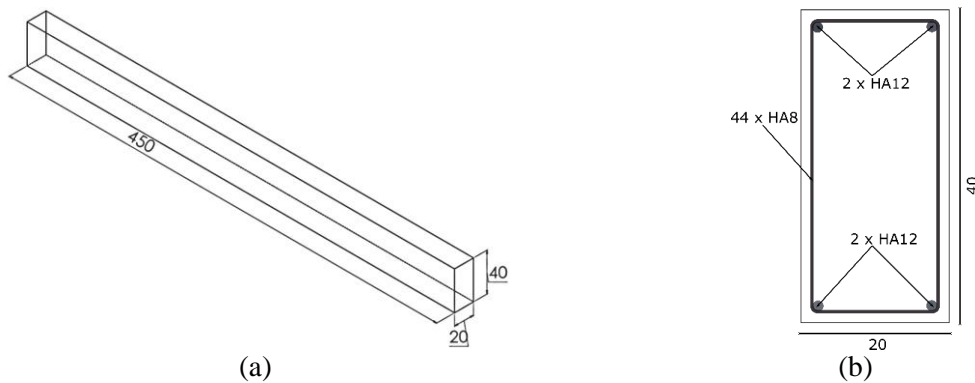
Specimen's design (dimensions in centimeters): (a) Geometry, (b) Reinforcement details
